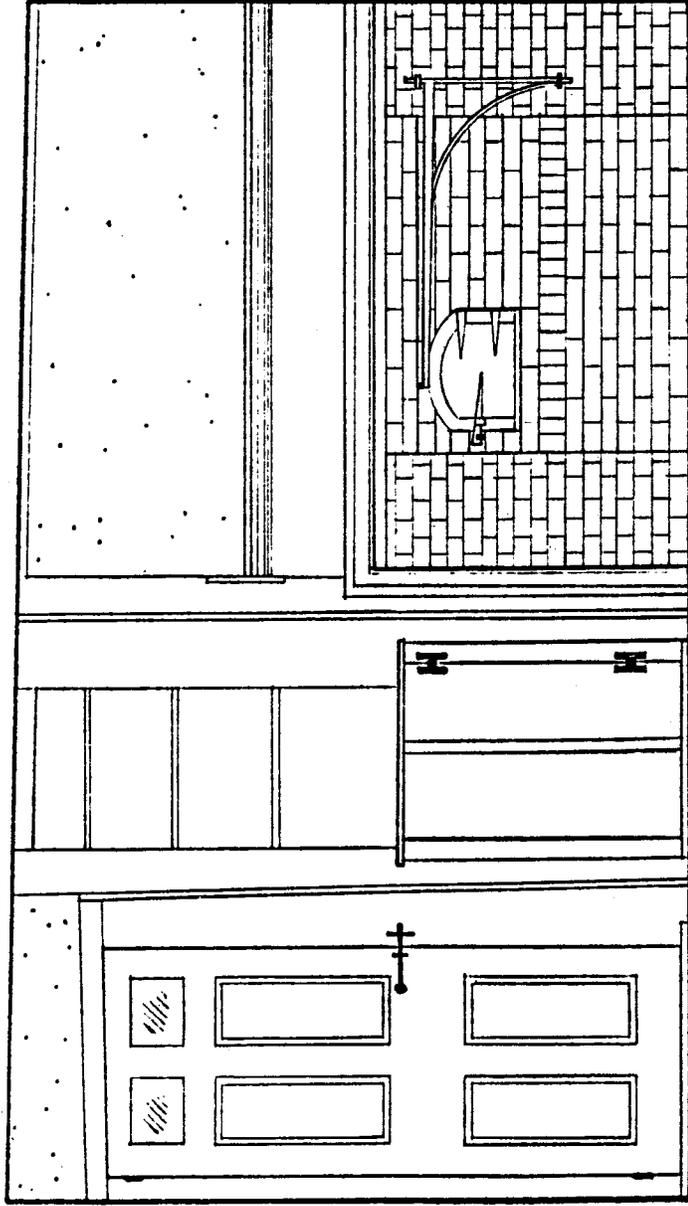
Atwood-Higgins House: East Kitchen, South Wall.
